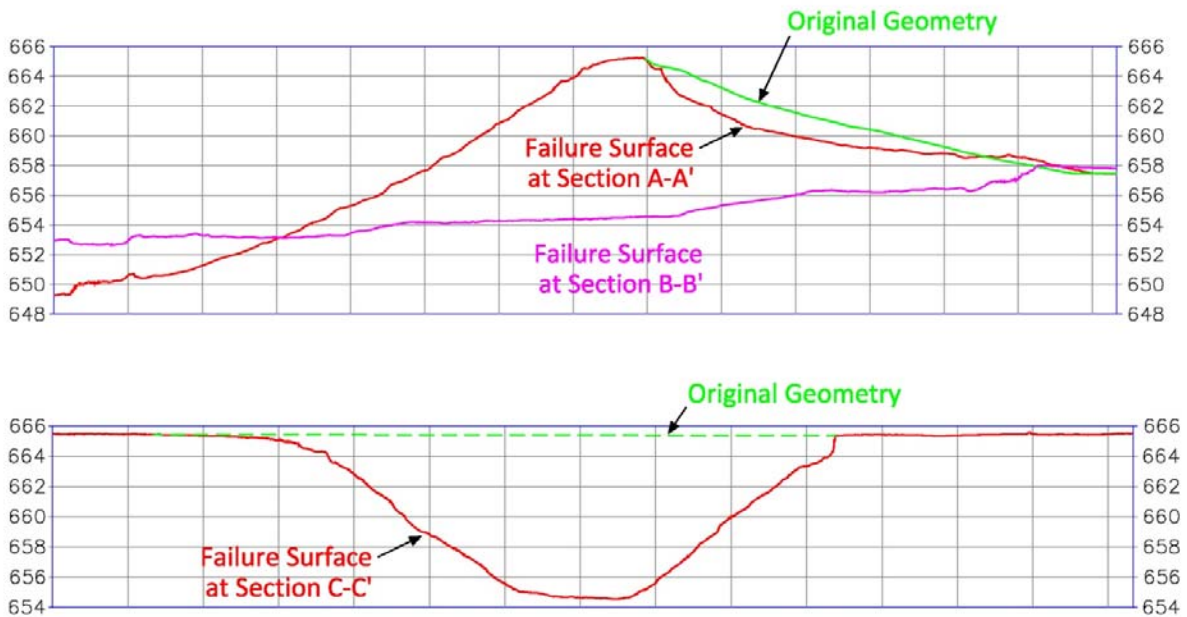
Cross-sections through the failure areas of Sparmos Dam (1:1 horizontal to vertical scale).
